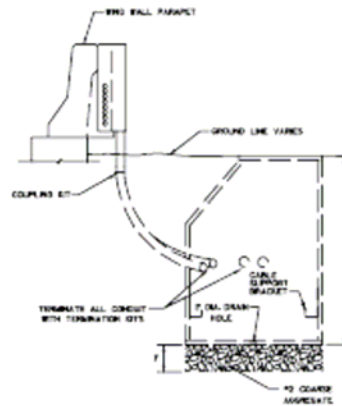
Conduit Transition From Trenched to Interior Parapet Conduit Systems
